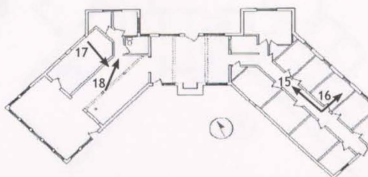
Bathroom and barrel room in west wing and west pavilion.
